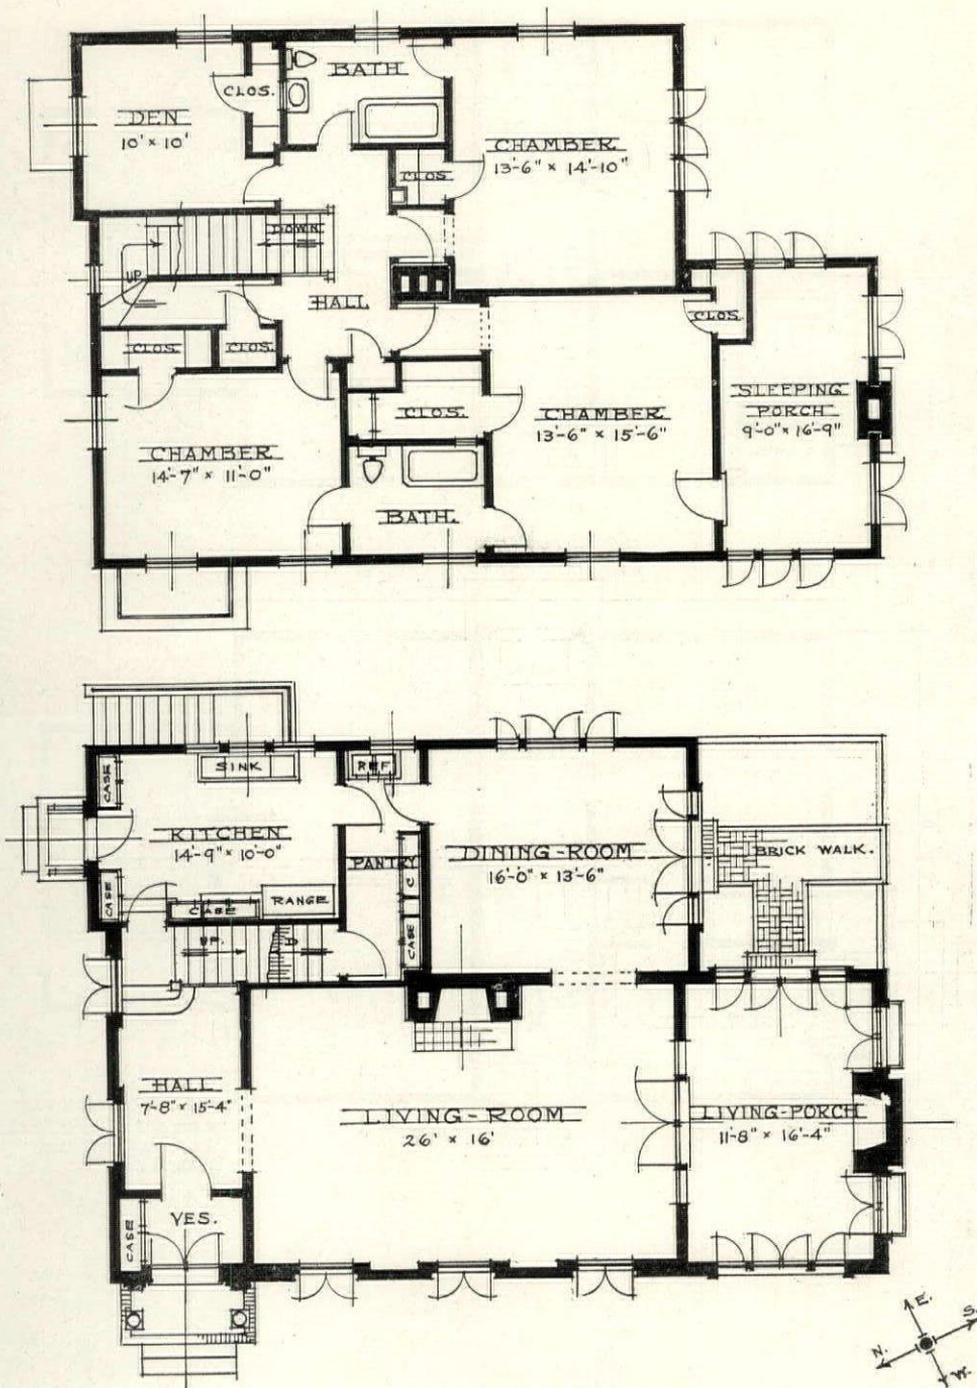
FIRST AND SECOND FLOOR PLANS—HOUSE OF HERBERT FLEMING, GLENCOE, ILL. J. A. ARMSTRONG, ARCHITECT.
